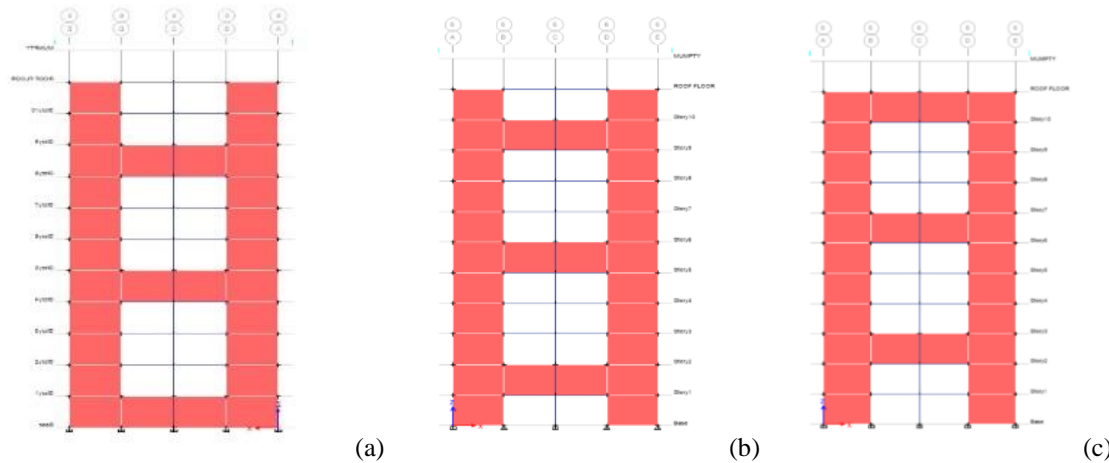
Placing flag wall on the; (a) 1st floor, 5th floor and 9th floor, (b) 2nd floor, 6th floor and 10th floor, and (c) 3rd floor, 7th floor, and the top floor
